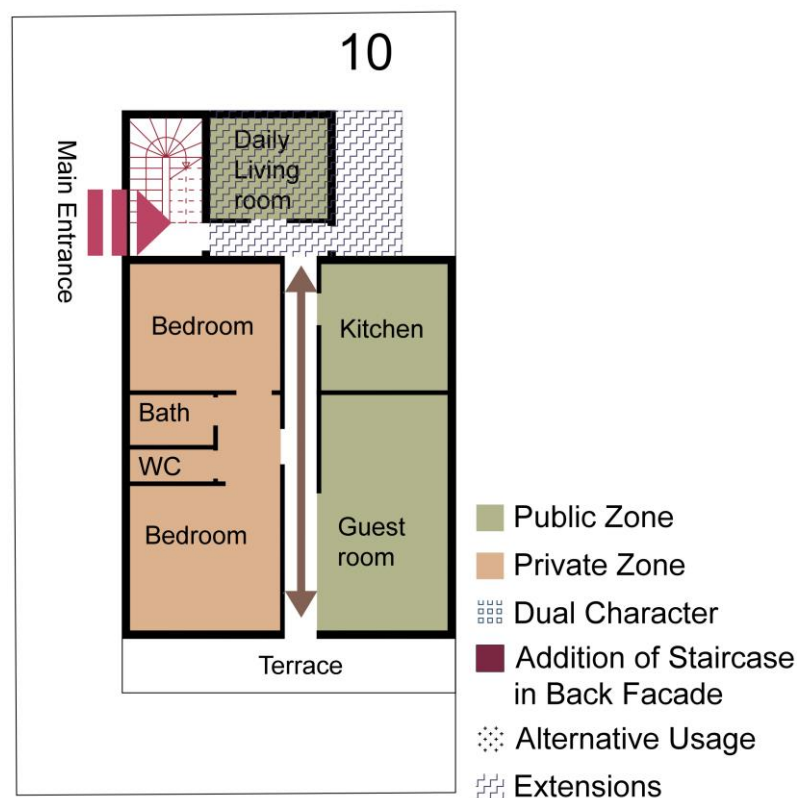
Upper floor sample of mutated type III with the addition of staircase in back façade (Author, 2017)
